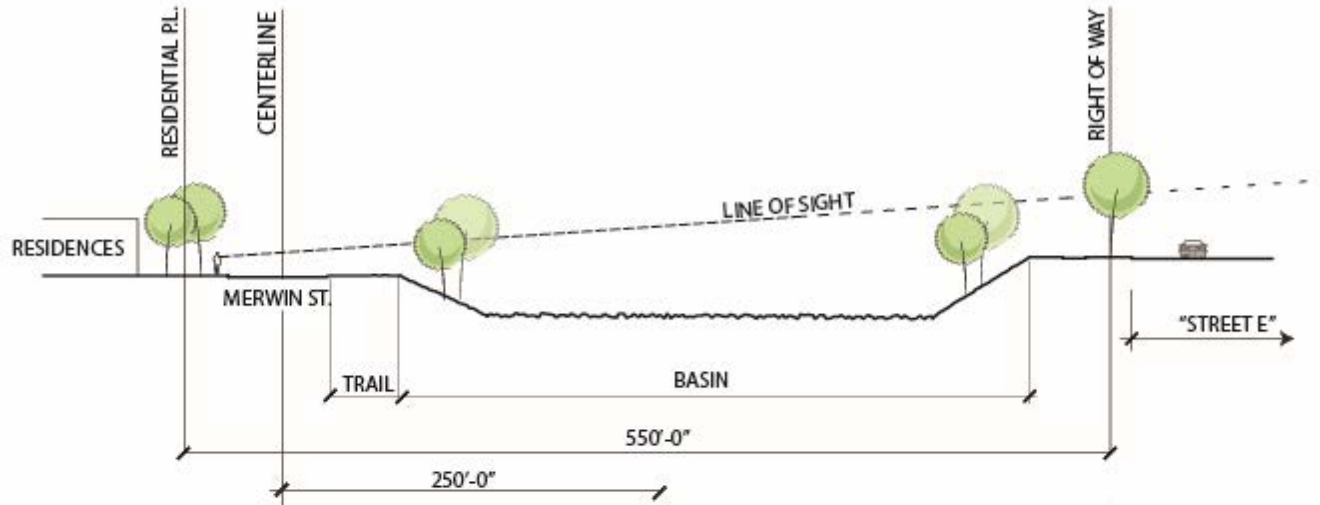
, 4-10 Bay Avenue Section D and Plan View D (pg.4-8)
